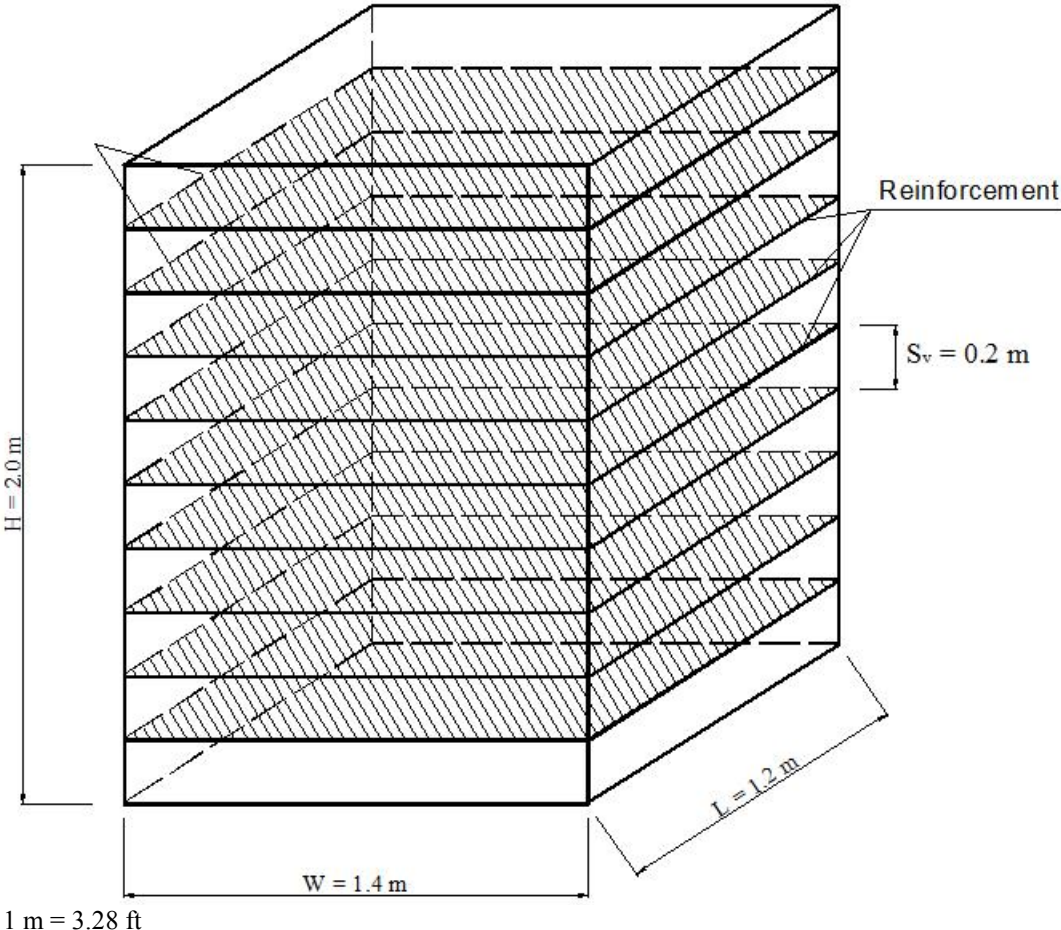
Illustration. Specimen dimensions for the GSGC tests.
